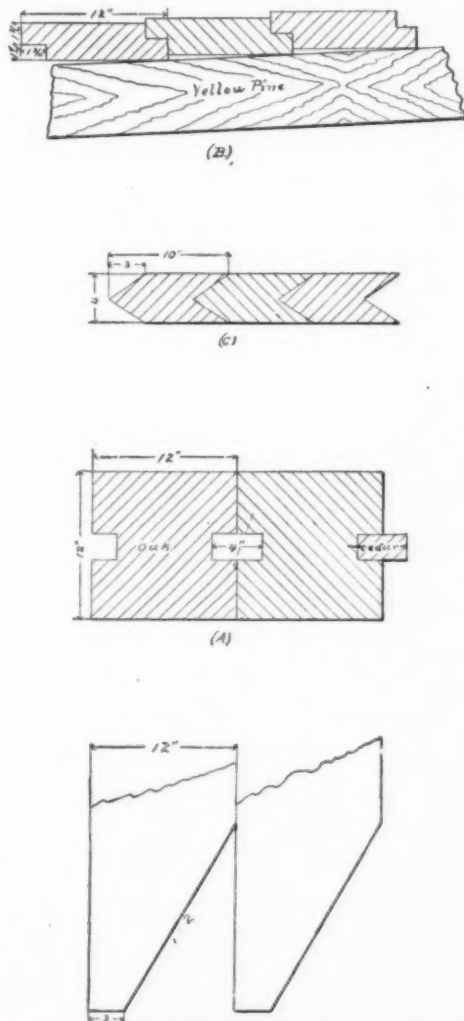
CROSS-SECTIONS OF SHEET PILING.
